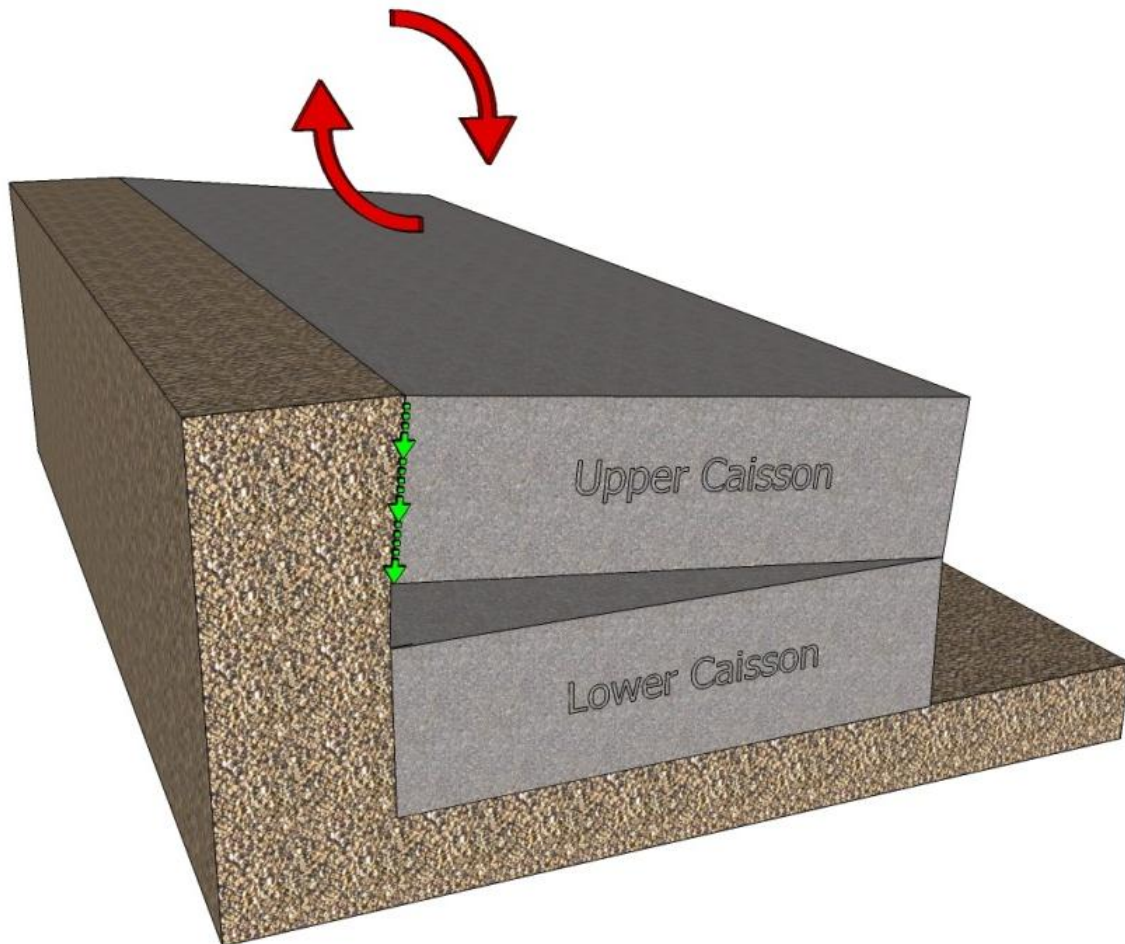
illustration failure mechanism, overturning of upper caisson
